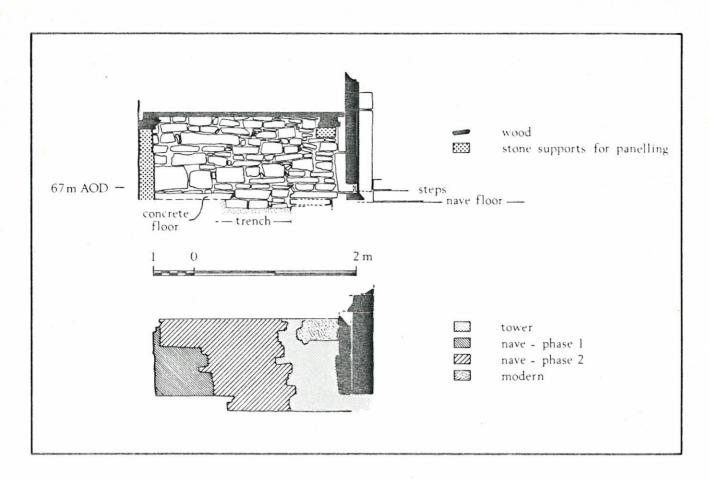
St Peter, Wootton Wawen: east wall of the nave, north of the tower arch Elevation and interpretation of fabric behind painting
